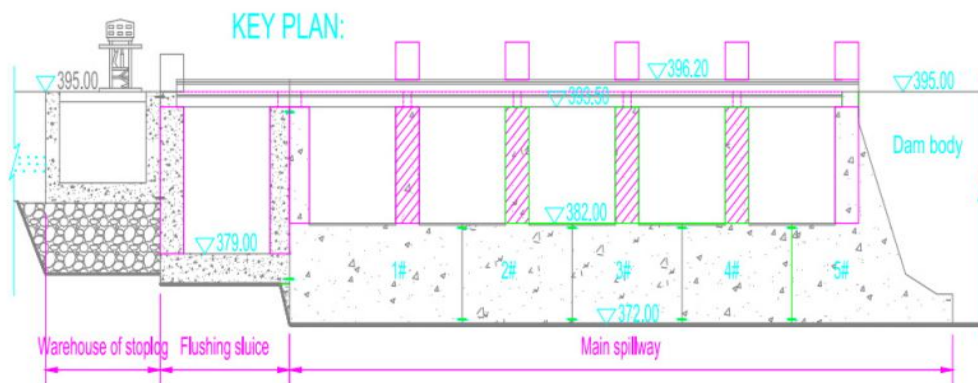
Structural frame model of the spillway and flushing sluice showing the key layout of the dam and adjacent structures.
